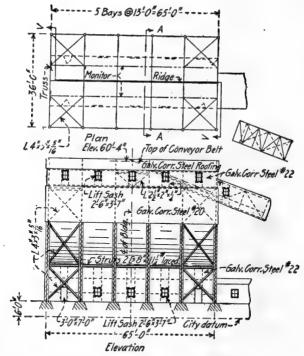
COAL BUNKERS, RAPID TRANSIT SUBWAY, NEW YORK, N. Y.
